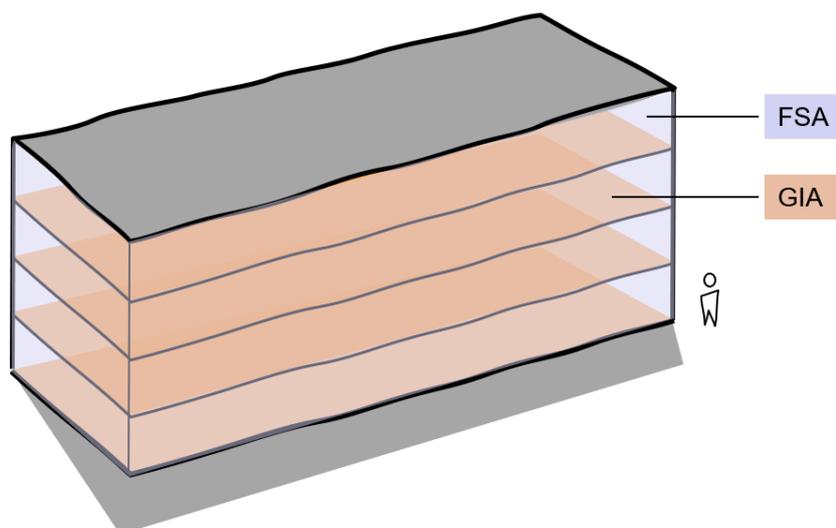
Sketch of simplified building indicating 'FSA' and 'GIA'
